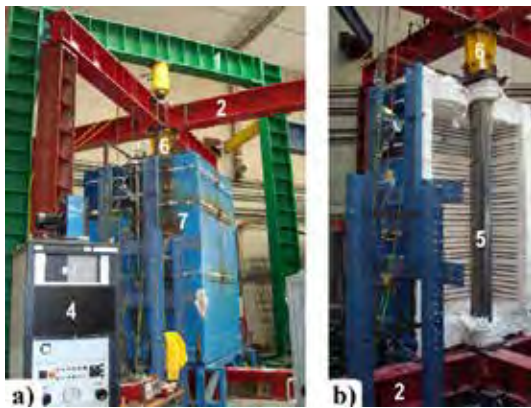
General (a) and detailed (b) view of the experimental set-up: 1 - reaction frame; 2 - restraining frame; 3 - hydraulic jack; 4 - servo hydraulic central unit; 5 - specimen; 6 - special device; 7 - electric furnace
